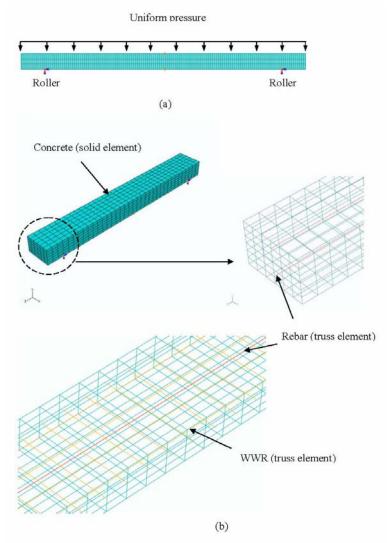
FE Models: (a) Loading and Boundary Conditions and (b) Concrete, Rebar and WWR Elements
